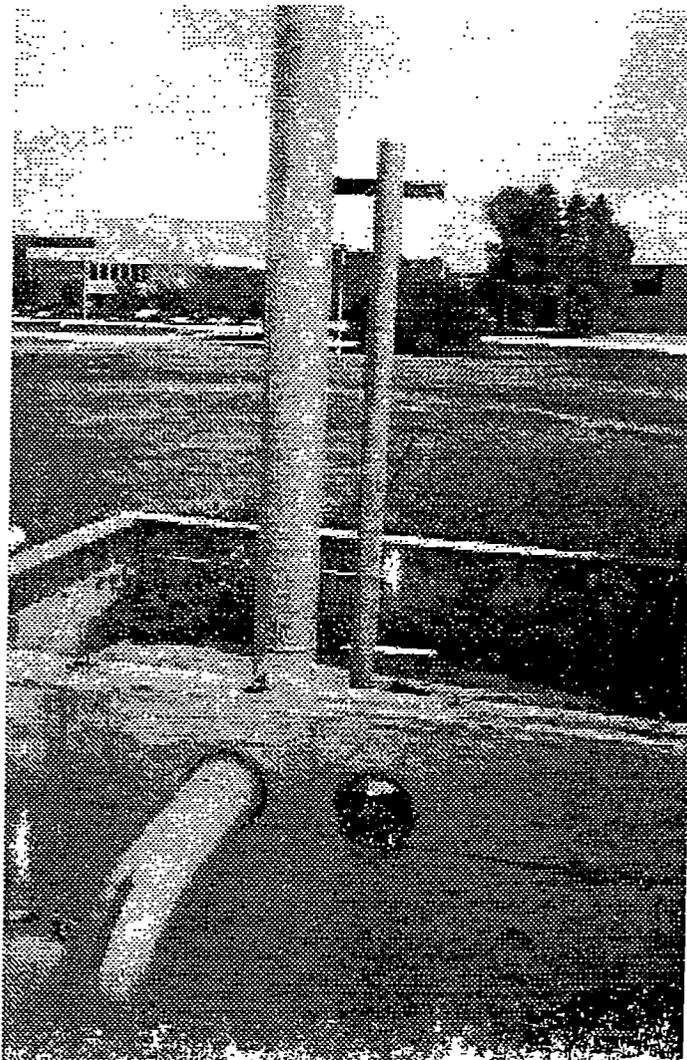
Vent pit after cover removal showing tank and pit vent piping.
